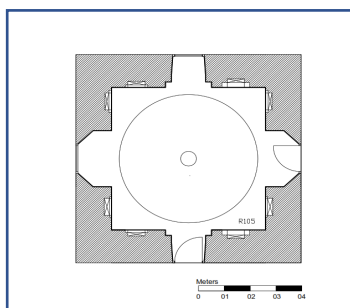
Floor Plan – Turkish Court at Guli Bagh (Covered Area 77.08m²)
